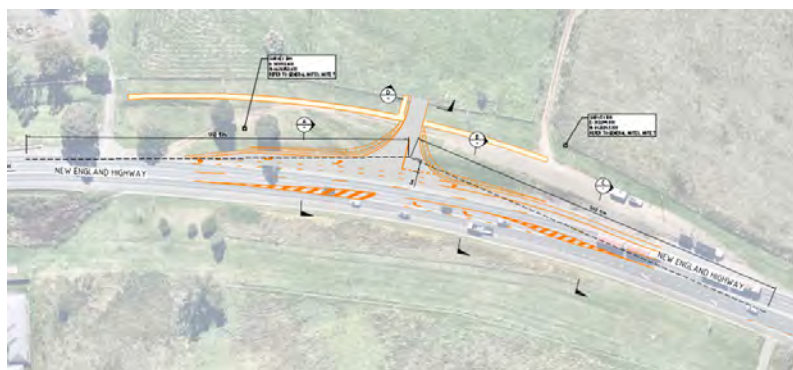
New England Highway Access Plan (Extracted from Civil Plans)
